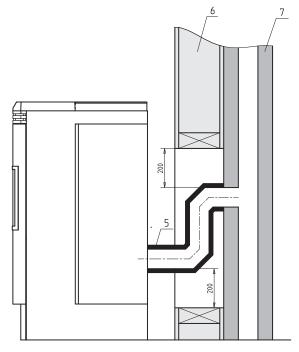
Tested masonry feed-throughs for exhaust pipe
